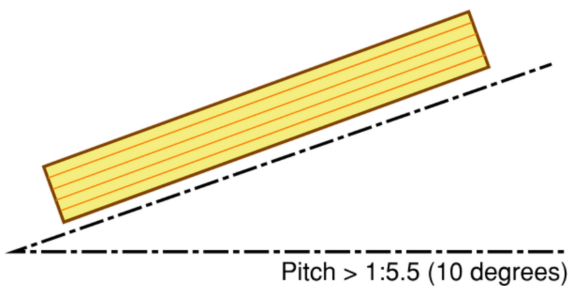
A minimum pitch of 10° was deemed necessary for roof to be constructed from CLT
